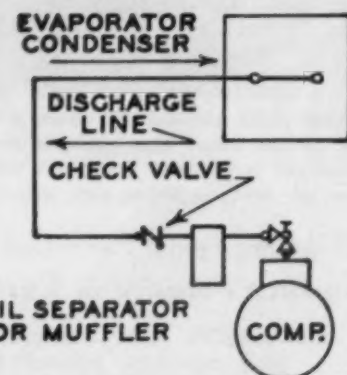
Check valve should be installed 5 ft. or more from compressor but never between oil separator and compressor.
